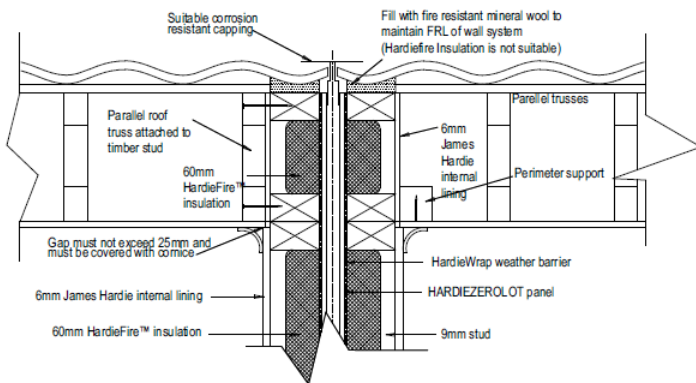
DUAL ZERO LOT PARAPET ROOF WITH PARALLEL ROOF TRUSSES
